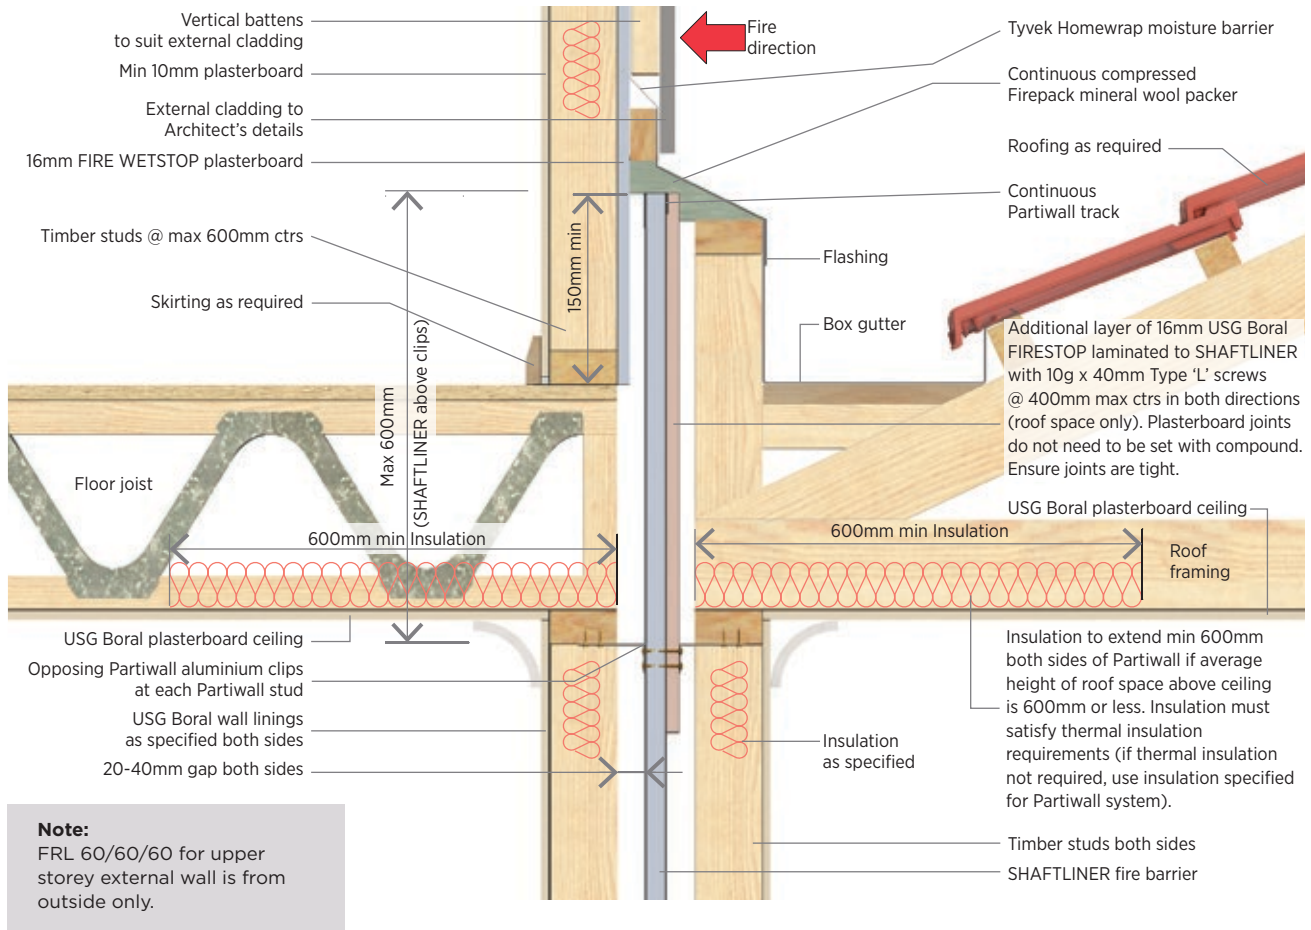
Flat Roof - Wall/Roof Junction Detail - FRL 60/60/60
